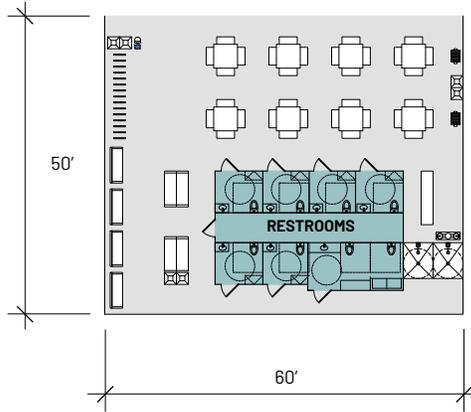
The plan of the Rest Pavilion (Tier II) example at river mile 50.9 shows how access is provided to the LA River multiuse trail and how stormwater can be treated prior to entering the LA River.
